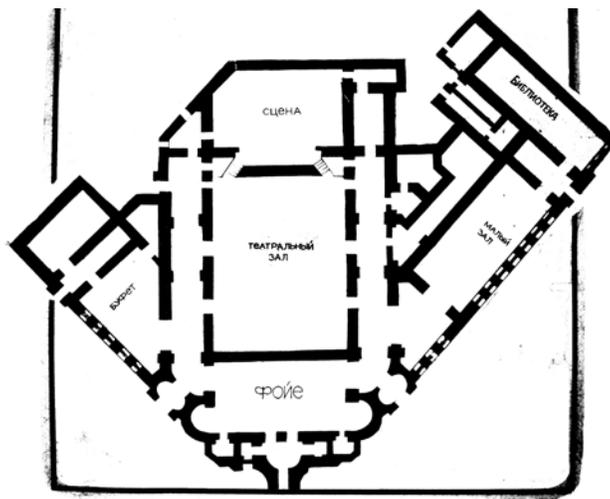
Floor plan of the Metalworkers’ Club in Kharkiv.
